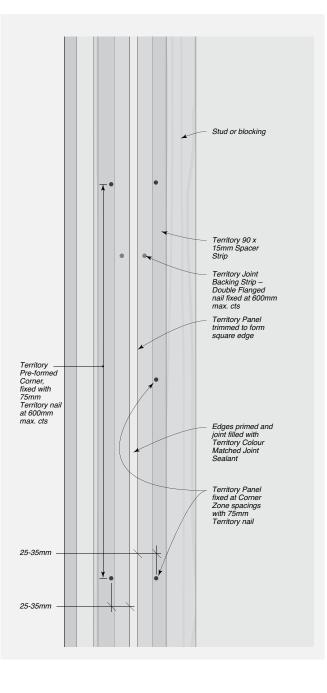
Typical Territory System Cross Section - Elevation
